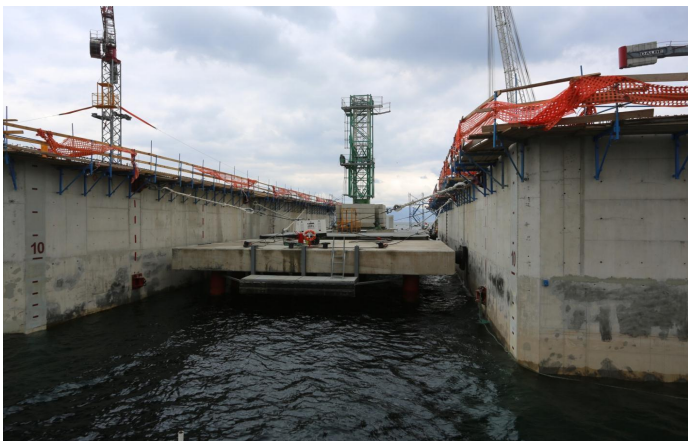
Soft Mooring of Caissons at Wet Dock, and Tower Crane under Erection (left), and Anchoring of Caissons at Wet Dock and Starting of Wet Dock Concreting Operation with Kazıkçı İbrahim (STFA's Barge) equipped with Concrete Pumps and ready to receive (STFA's) Concrete Mixer Carrier Barges (Towed by STFA's Tug Boats). Courtesy of STFA Construction Co.
